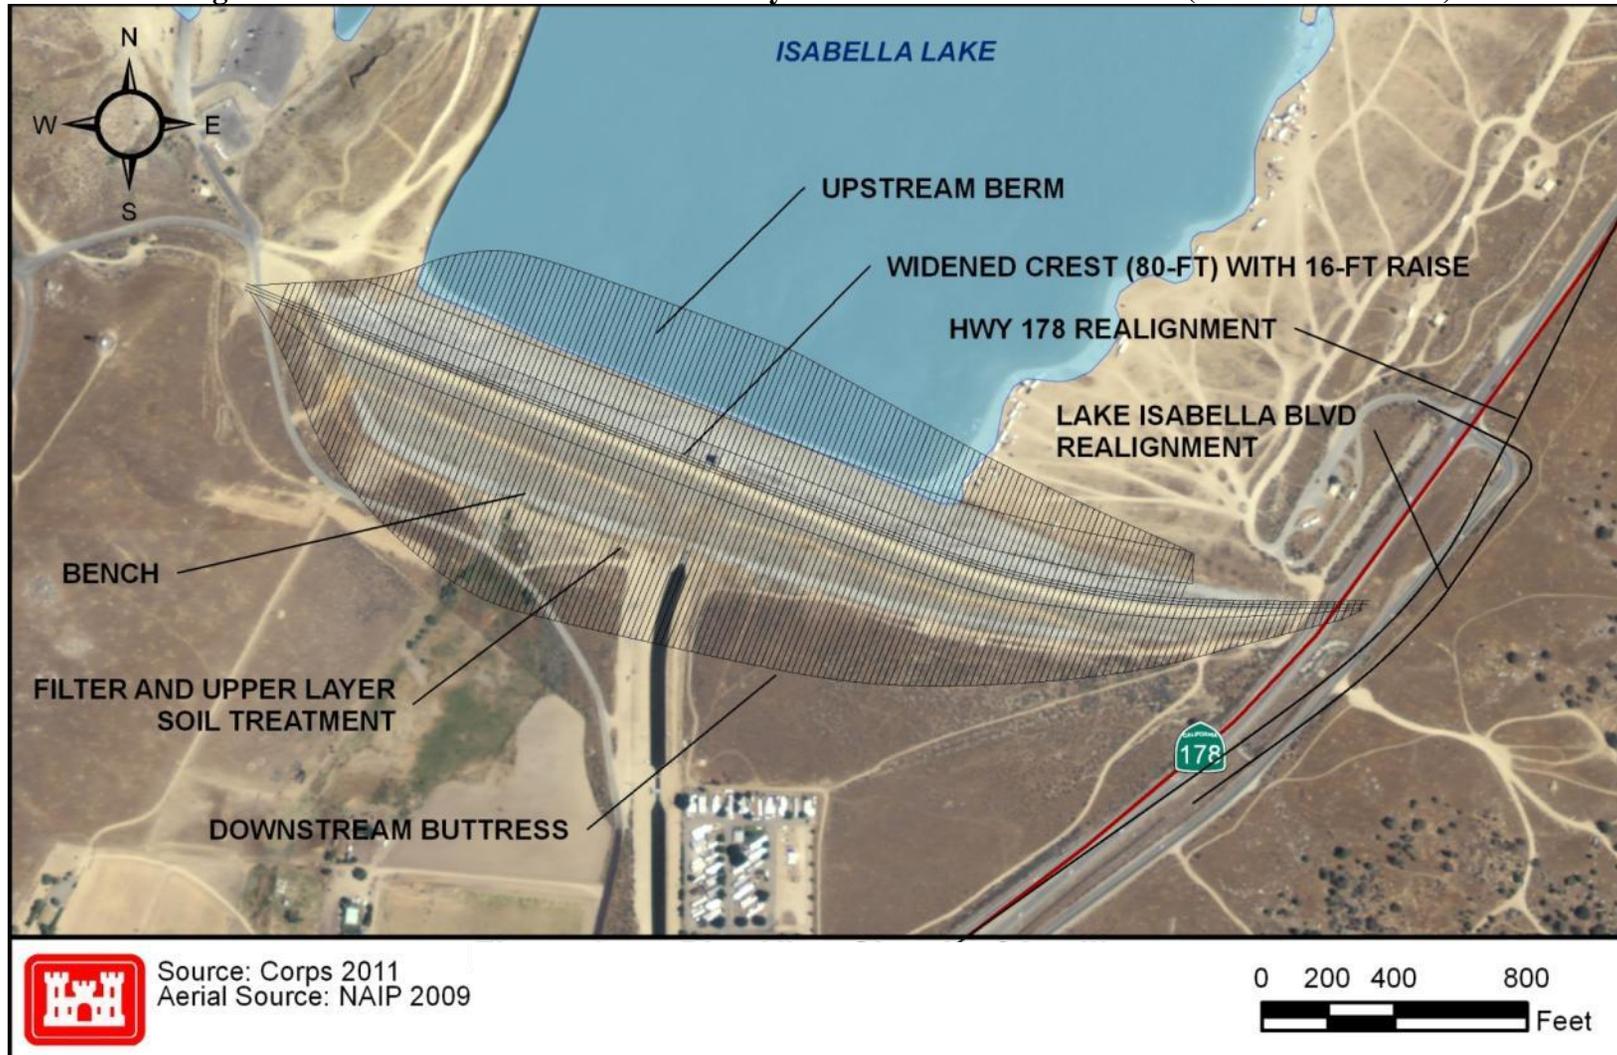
Plan View Sketch of Main Dam with Full-Height Filter (Alternative Plan 4)
